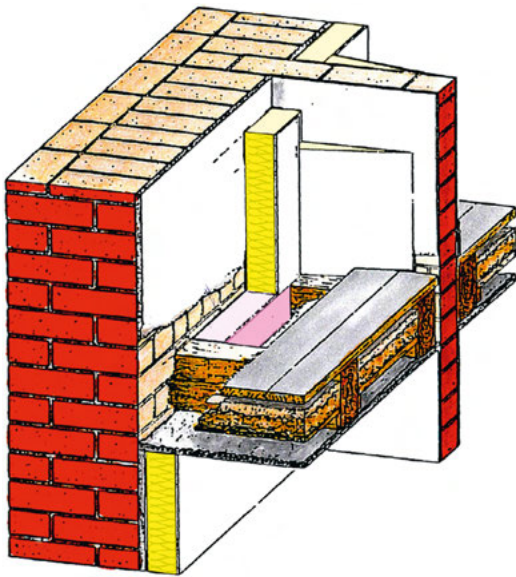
Insulation and sealing of the spaces between the beams of a wooden beam ceiling in a solid masonry structure
